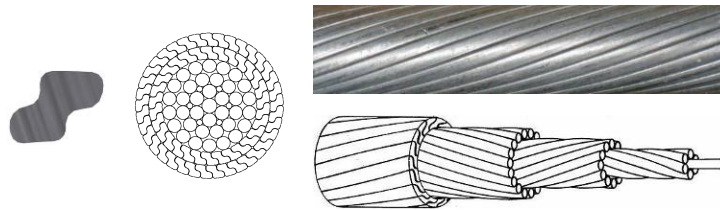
Full lock wire, locked coil strand cross section and locked coil strand side view
